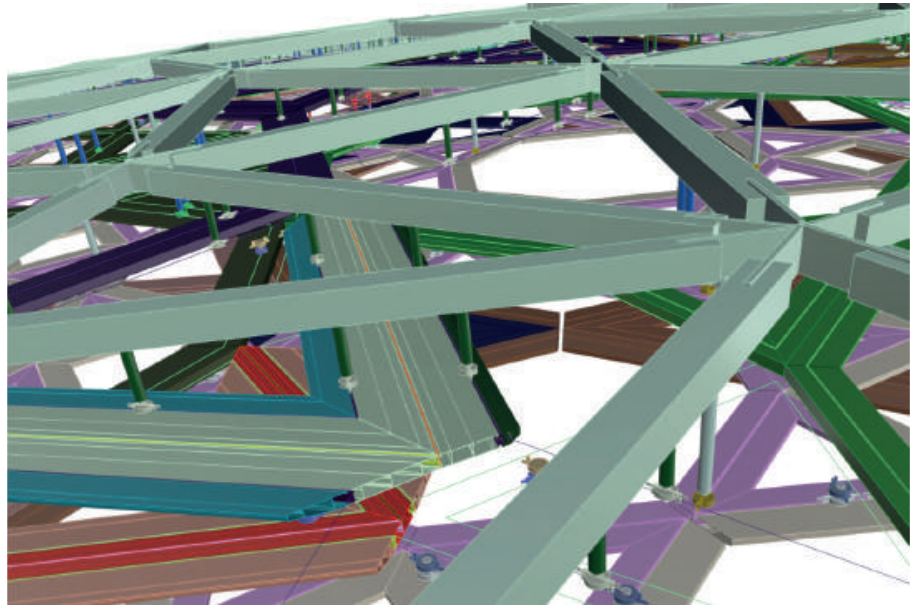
Digital model of layers of aluminium cladding connecting to structural steel.
